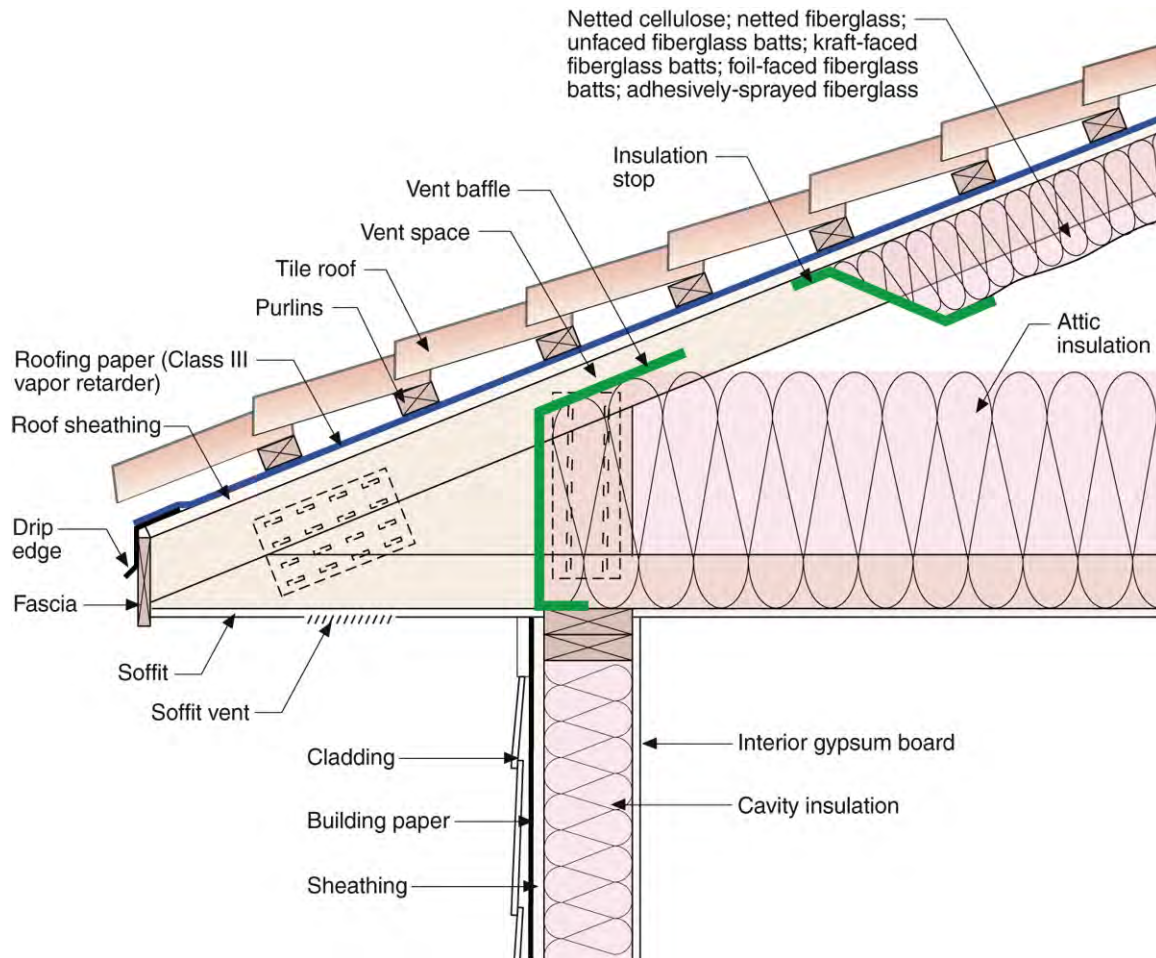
Vented Attic – Tile Roof – Air Permeable Insulation On Underside of Roof Deck - Can be used in all climate zones. In CEC Zone 16 (IECC Climate Zone 5 or higher) a Class II vapor retarder should be installed at the ceiling plane below the insulation. In all other climate zones a vapor retarder is not required. A ventilation ratio of 1:300 is recommended in all climate zones and is a basic code requirement in the IRC for vented attic assemblies.
